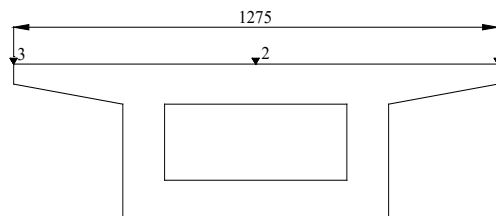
Layout of observation points for deformation of the concrete box girder (unit: cm)
